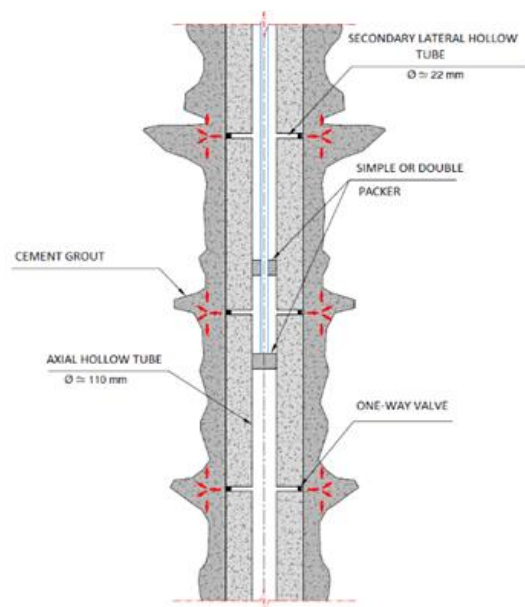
Longitudinal section of the shaft grouted driven concrete pile
